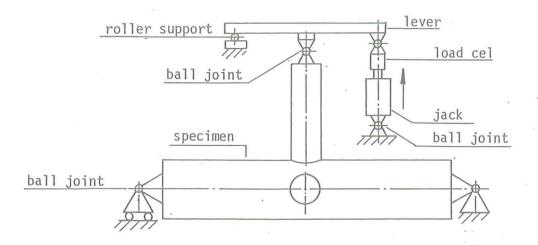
Test rig for Ø914.4 mm tubular X-joints (axially loaded) (used for specimen 34 35 39 40)
